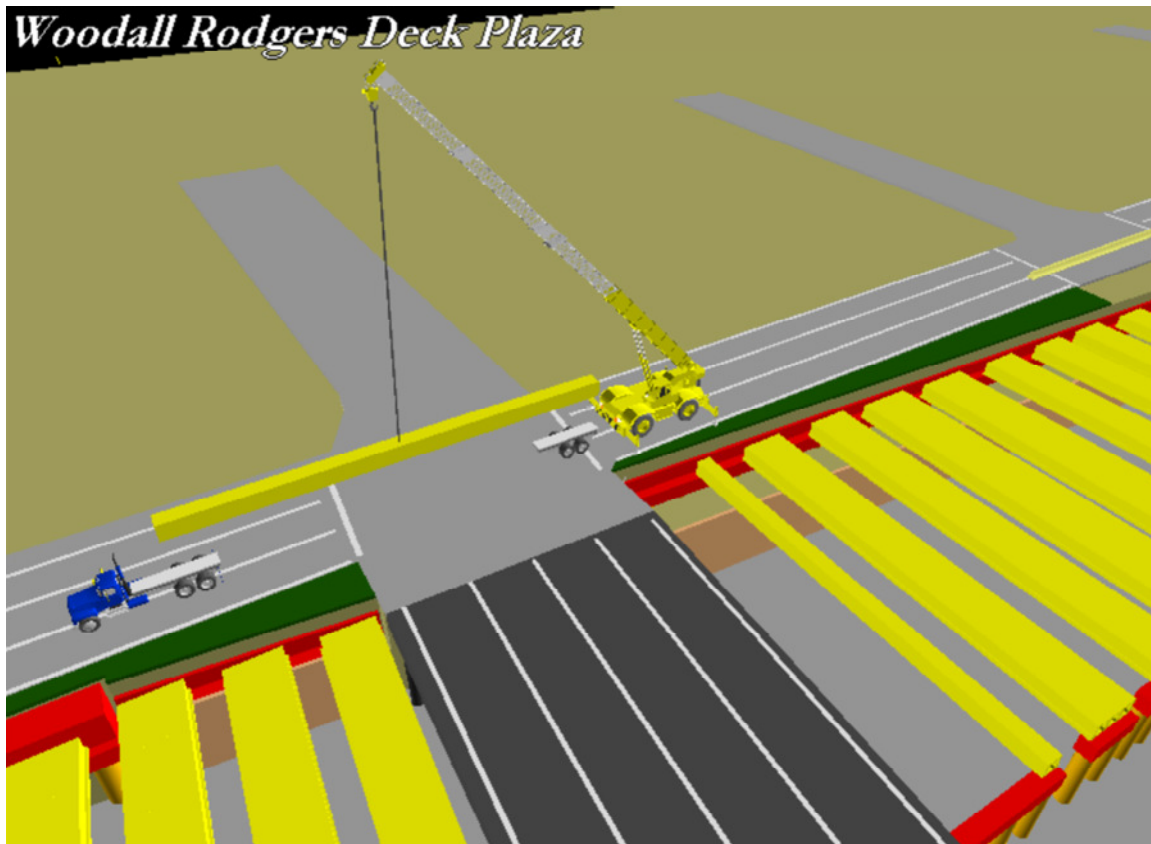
3D Model of a Crane Placing Beams Located On the Frontage Road
